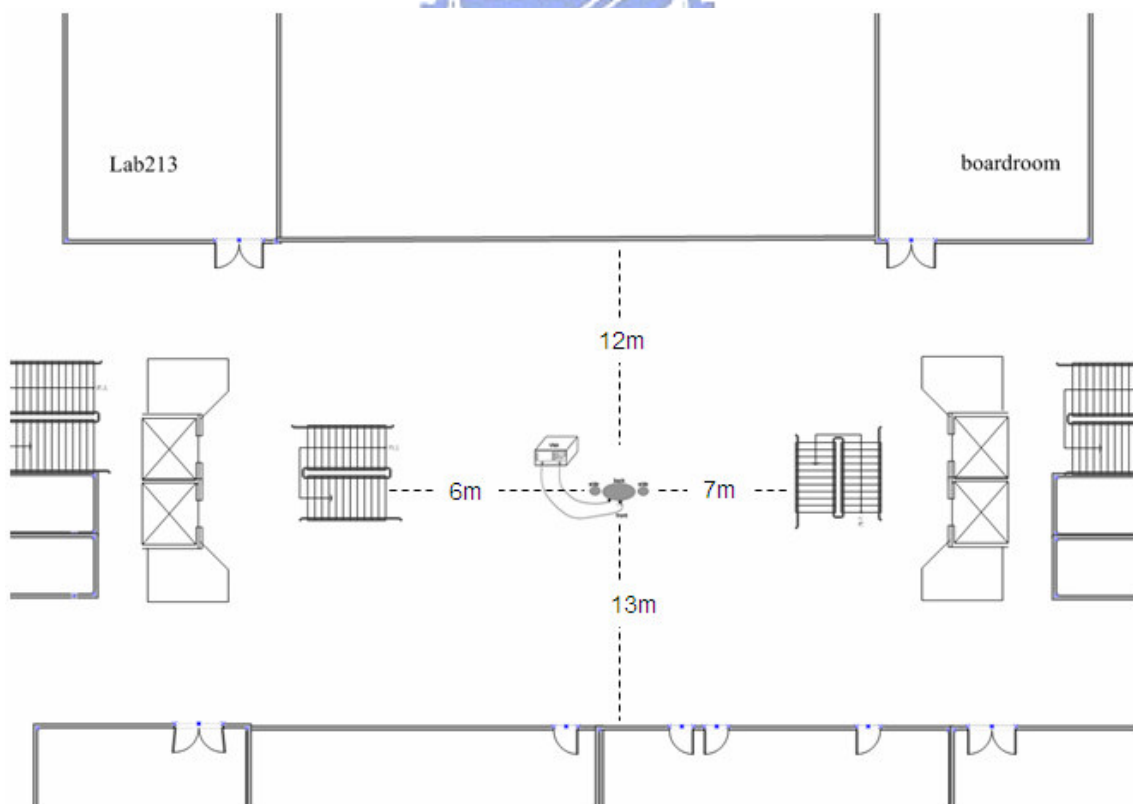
(c) Floor layout of site C (without local scatterers), which is located at 2nd floor of MISRC.
